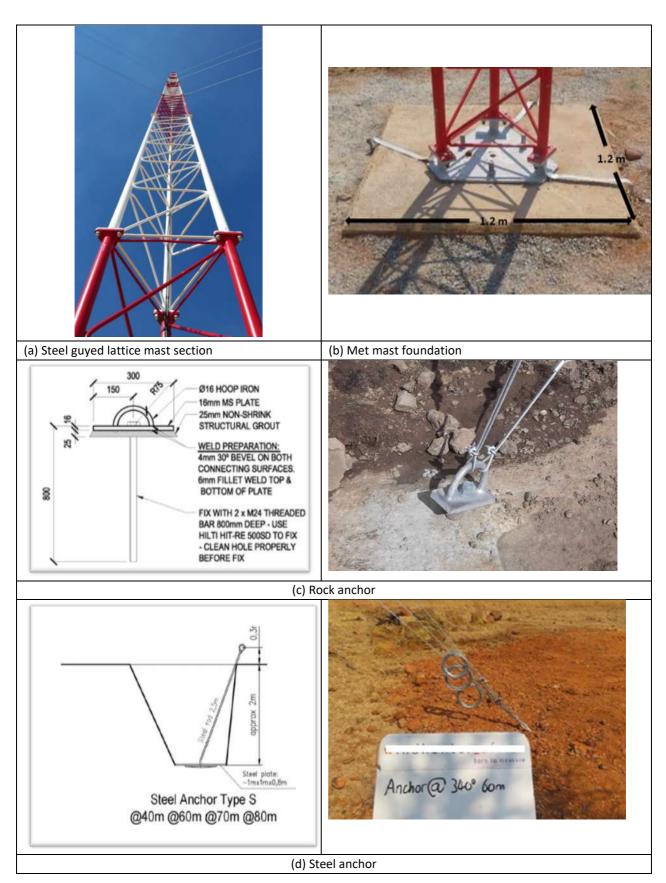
MET MAST STRUCTURE AND FOUNDATION
